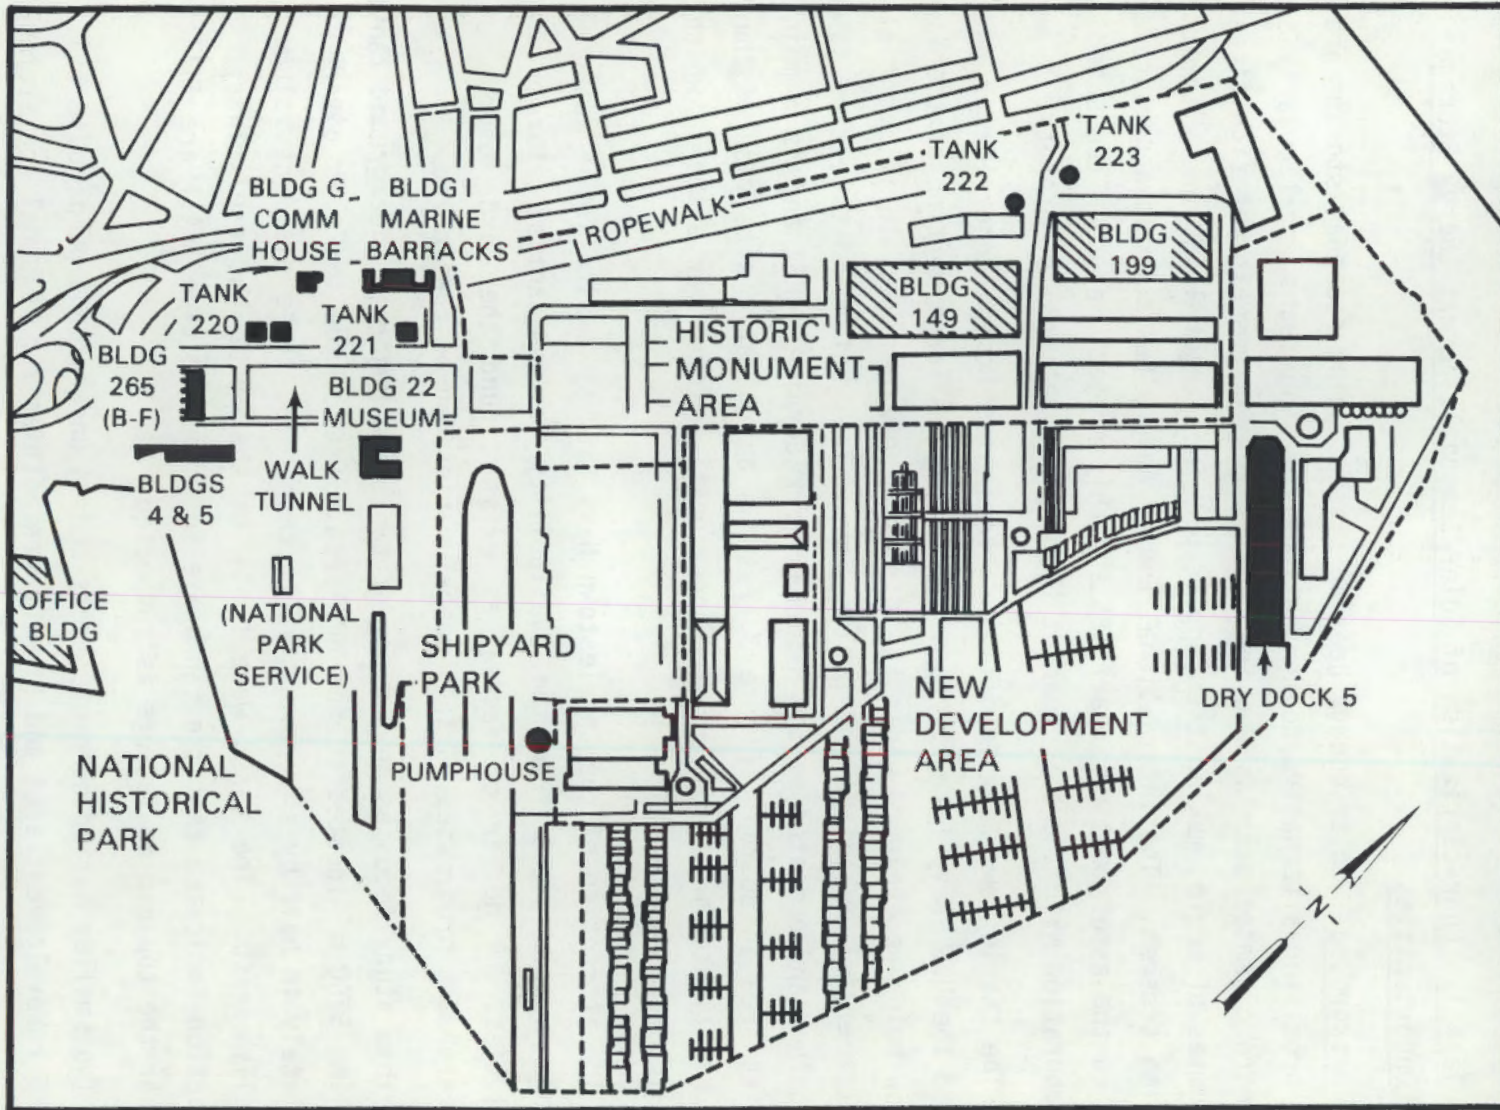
Charlestown Navy Yard Schematic Site Plan
